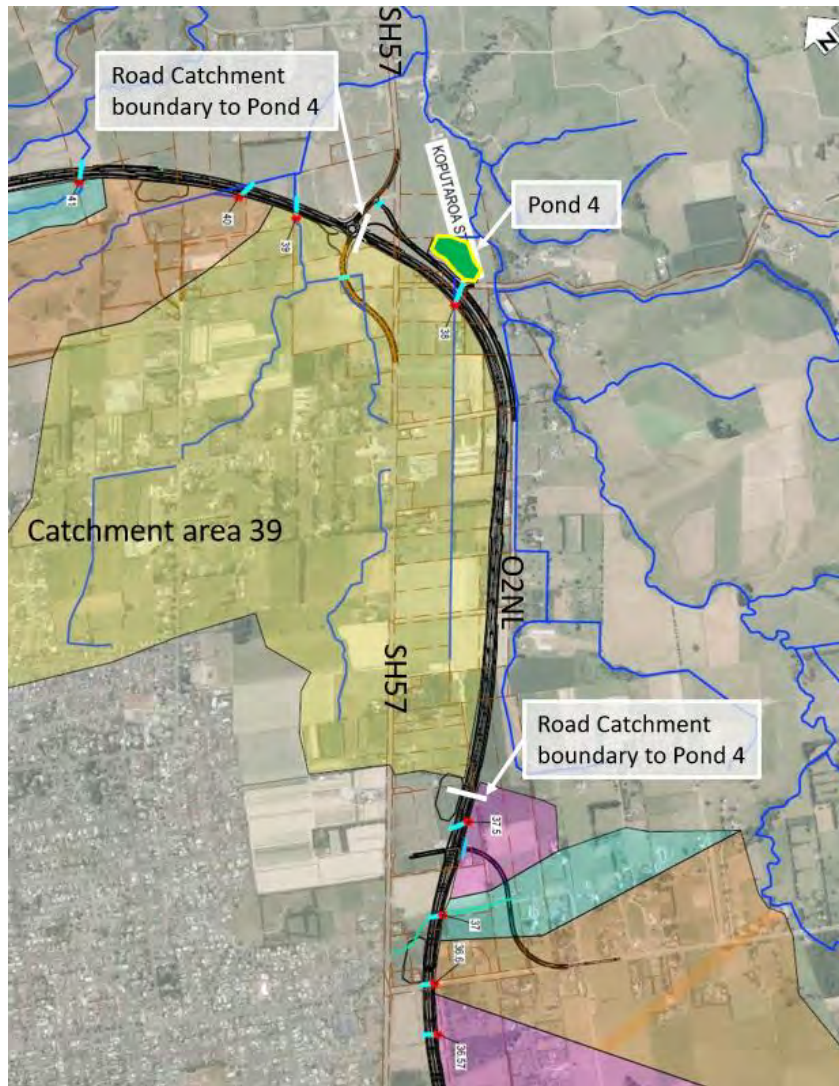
Catchment Areas near Pond 4 –indicating the length of road corridor that drains into Pond 4
